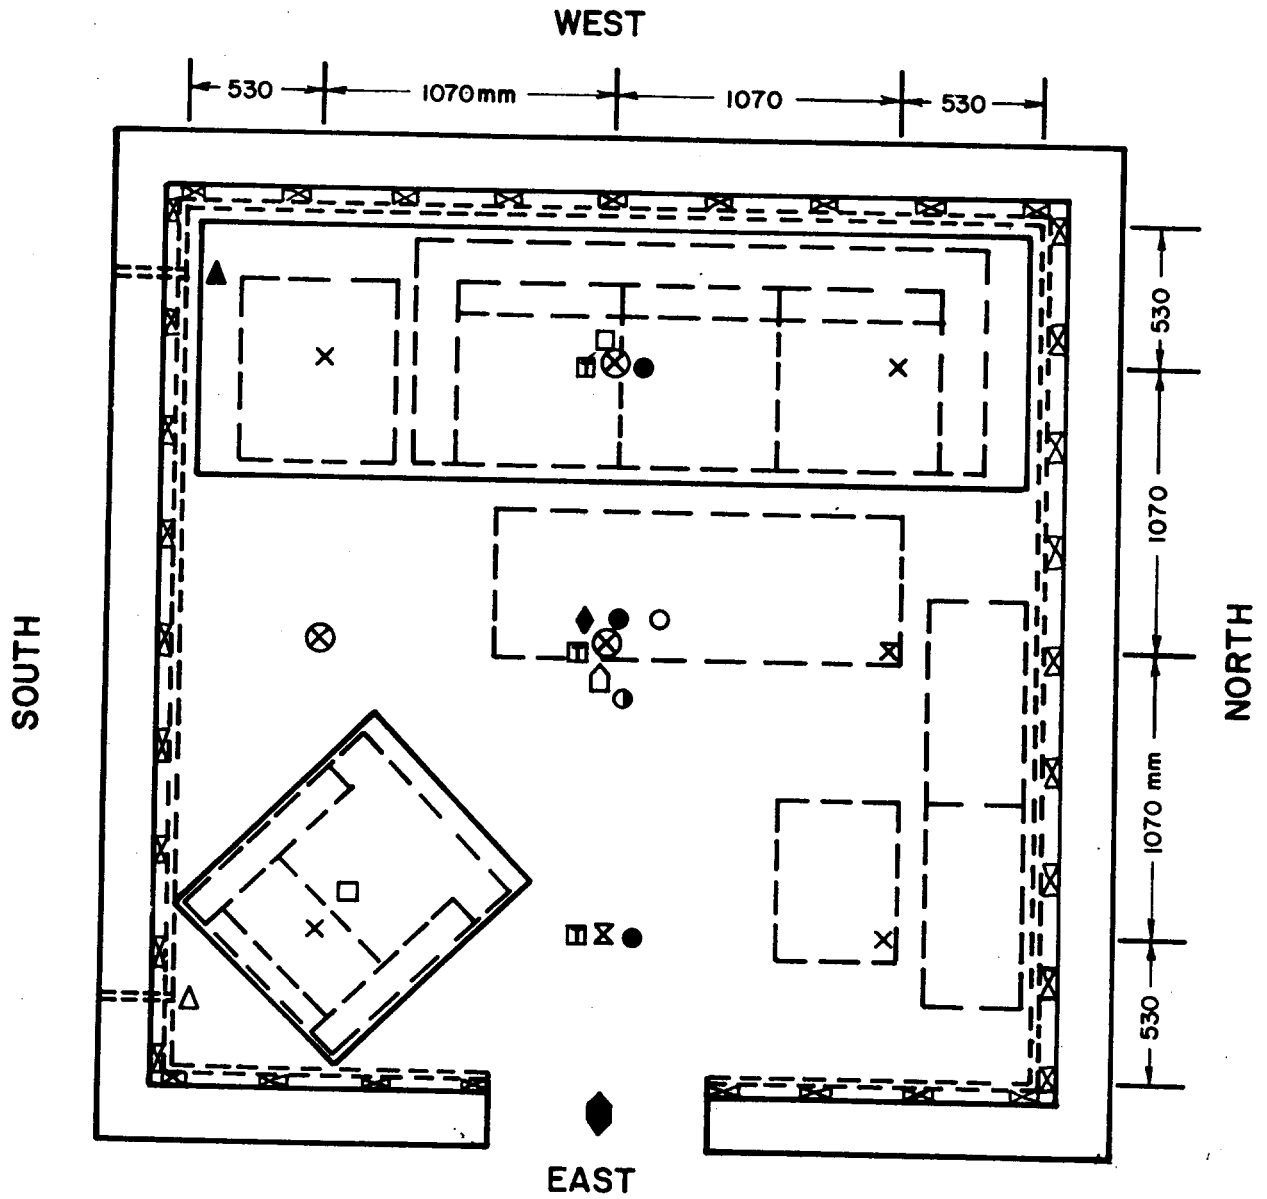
Plan view of the 3.3 x 3.3 m test room showing instrumentation layout
